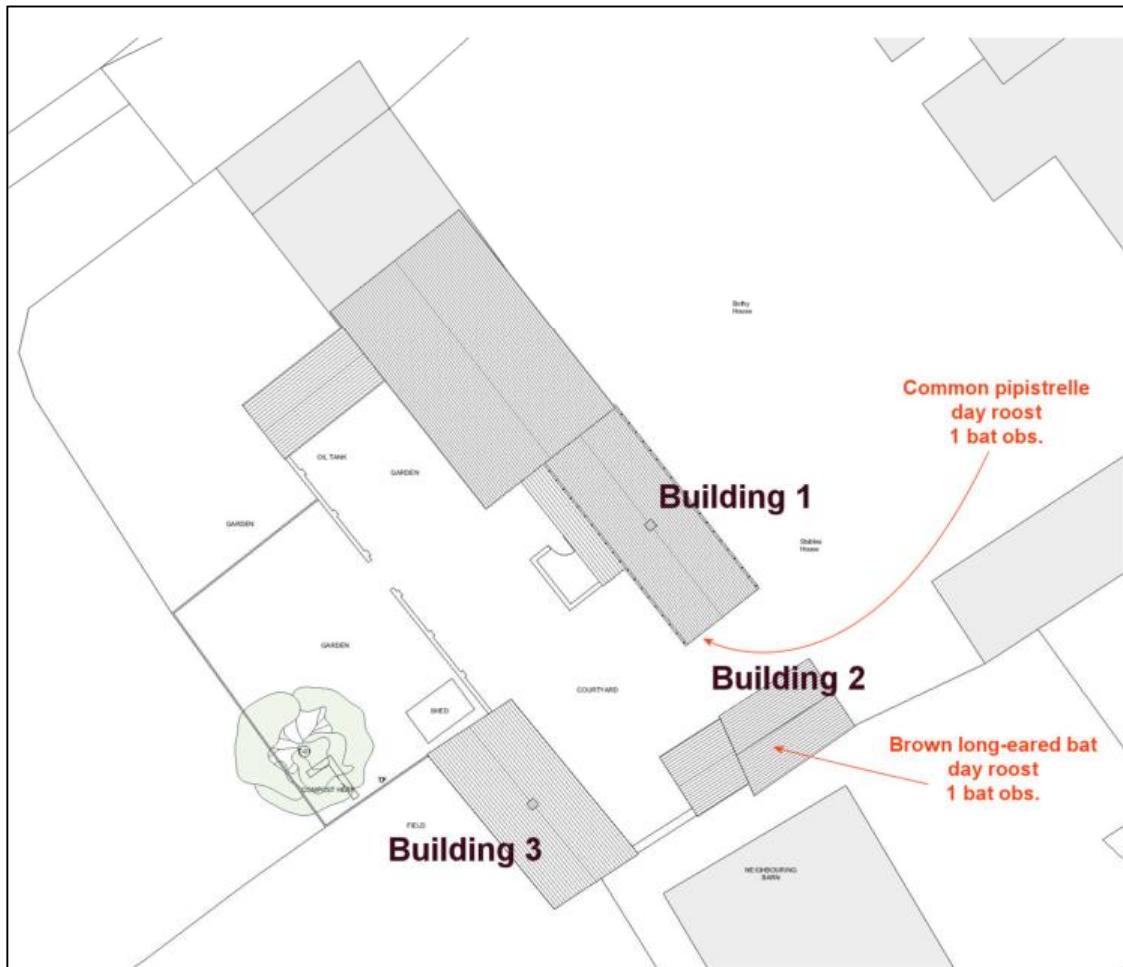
Plan of the site showing the location of the surveyed buildings and the identified bat roosts (from William Green Architects Drawing No: 19246 1_102)
